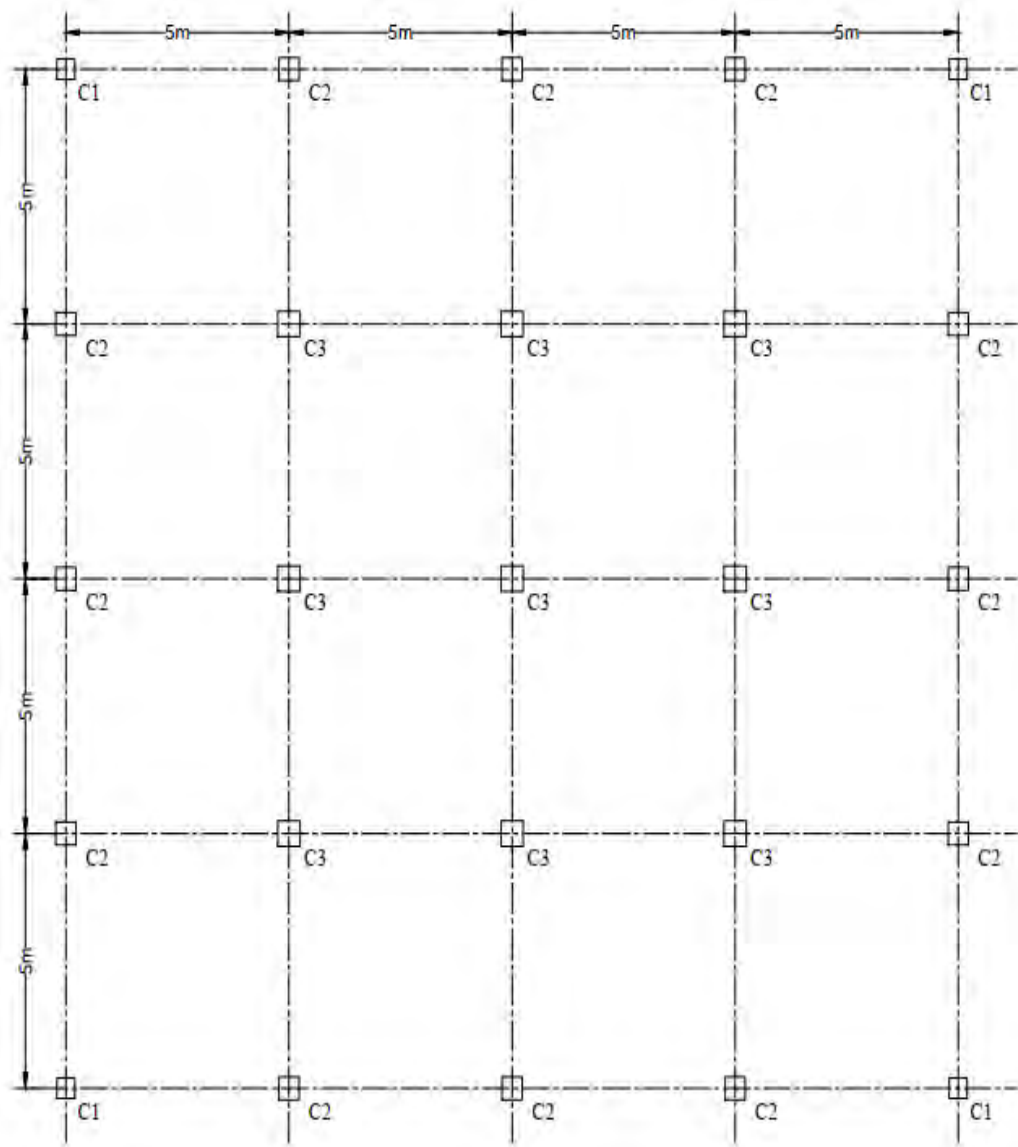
Typical plan for 6,10,15-storied RC buildings
